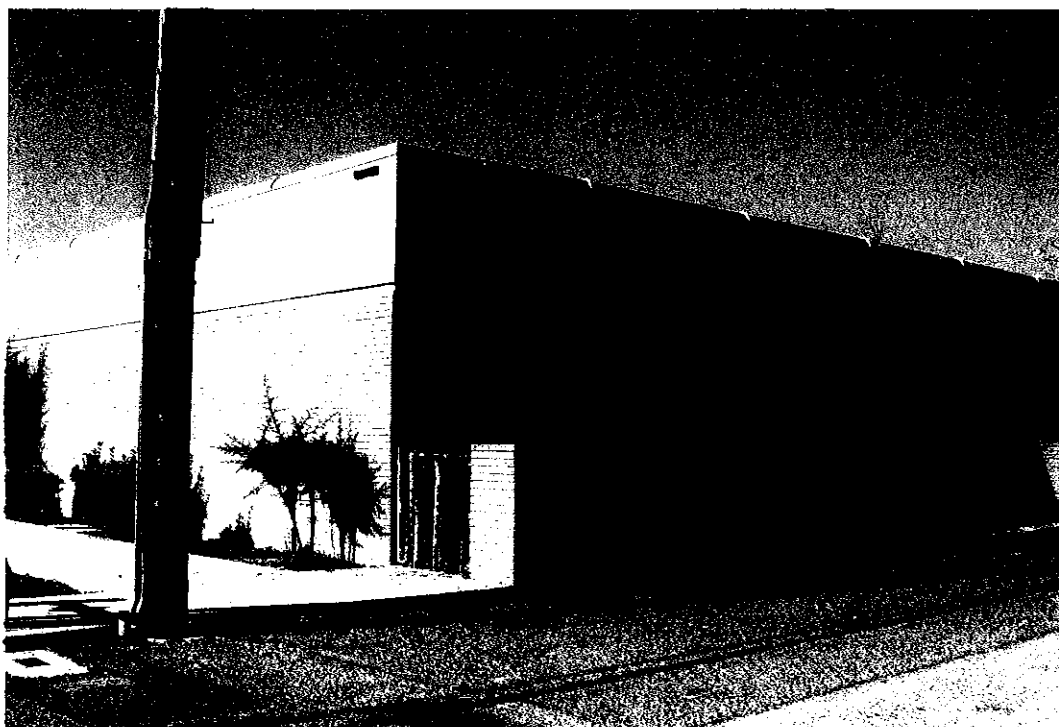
NORTHEAST CORNER OF SUBJECT BUILDING
